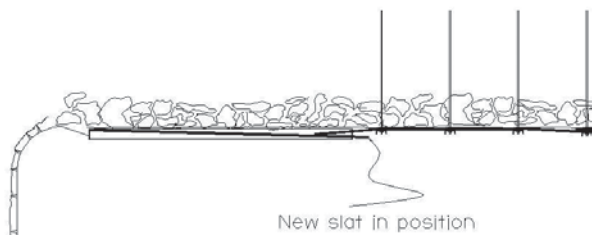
McNally system – new roof slat fully inserted, overlaps last installed slat
